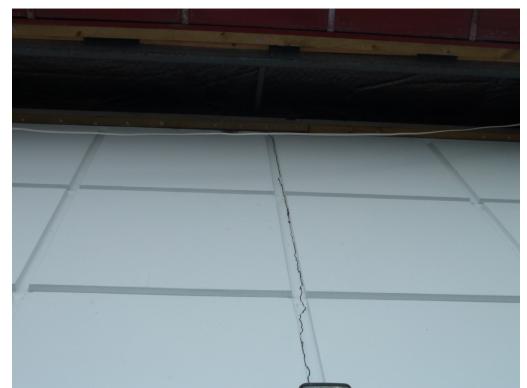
Vertical crack propagating from the access way in the south wall panel approximately 5mm width
